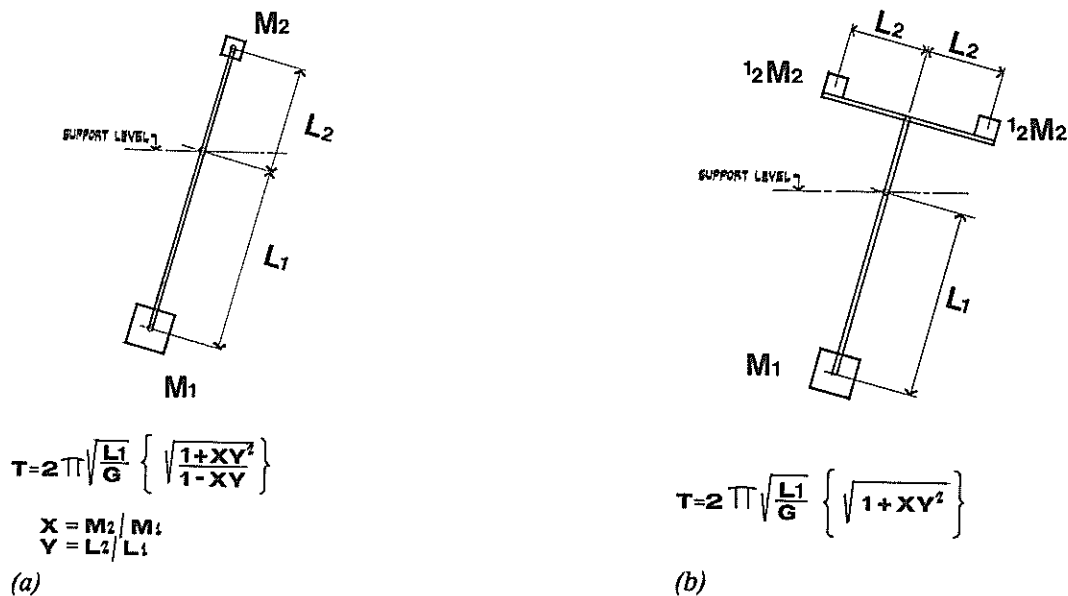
(a) Rigid pendulum-type damper with counterweights; (b) flat-arm pendulum-type damper
